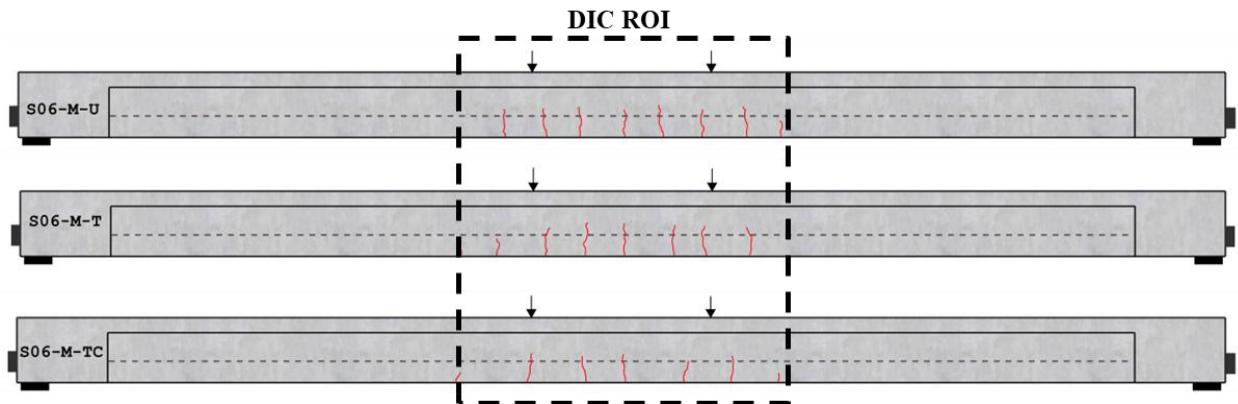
Crack map showing the observed cracks on the east face of the S06 beam specimens at the cracking load (concrete tensile stress at  $12\sqrt{f'_c}$ ).
